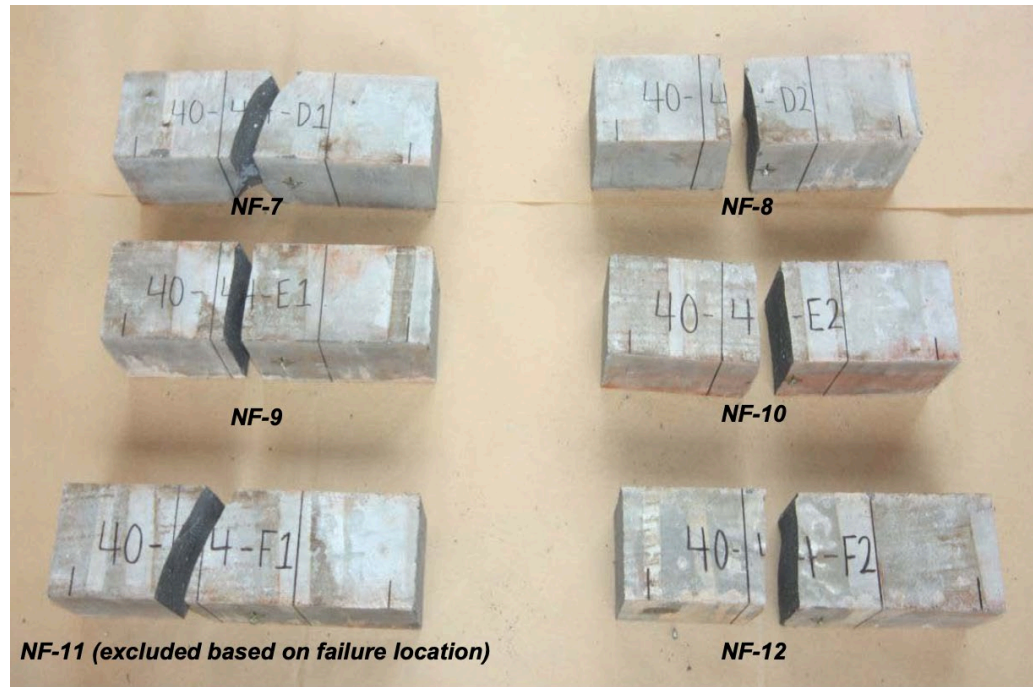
Unreinforced Cor-Tuf beams after failure [9].
